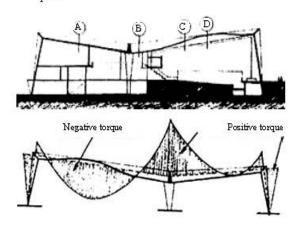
Ceiling of UNESCO building designing based on bending diagram
